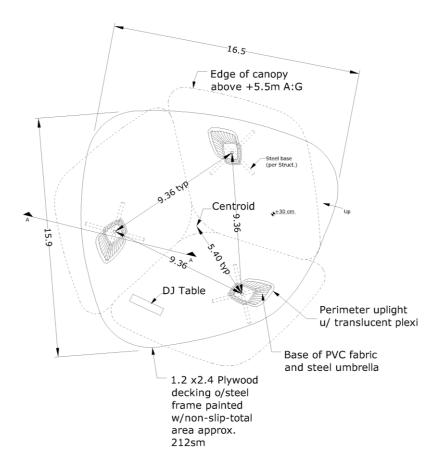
Detail Plan of the 2007 Serpentine Pavilion. Source: Plan scheme is produced by the author.
